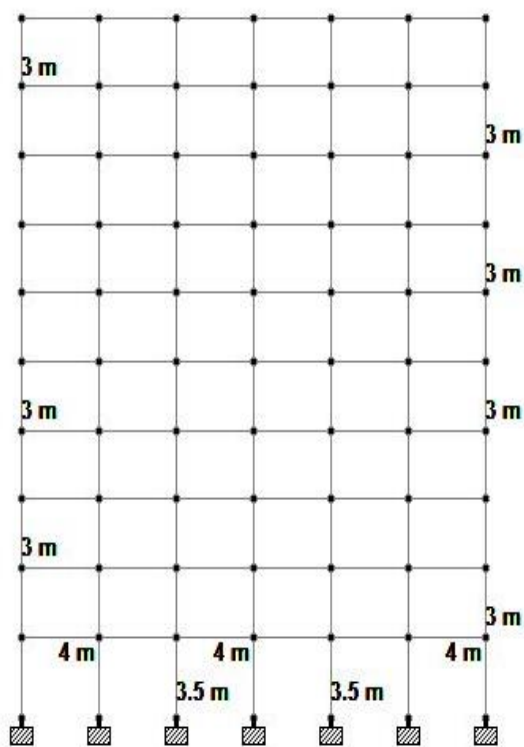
FIG. B: ELEVATION OF CONVENTIONAL SLAB WITHOUT SHEAR WALL FOR 10 STOREY BLDG
